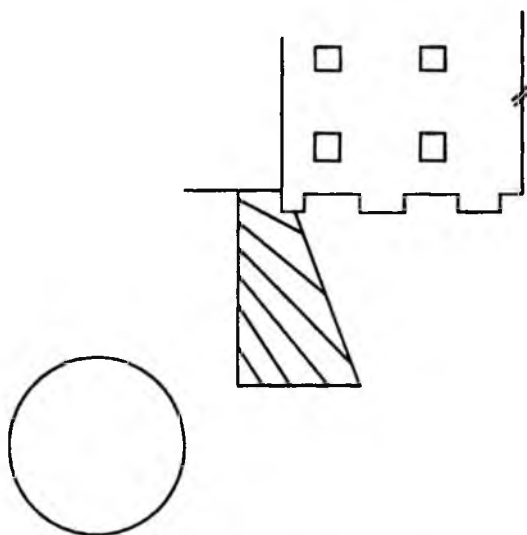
Sleeve-pipe grouting for building protection of alongside tunnel excavation (automatic section)
